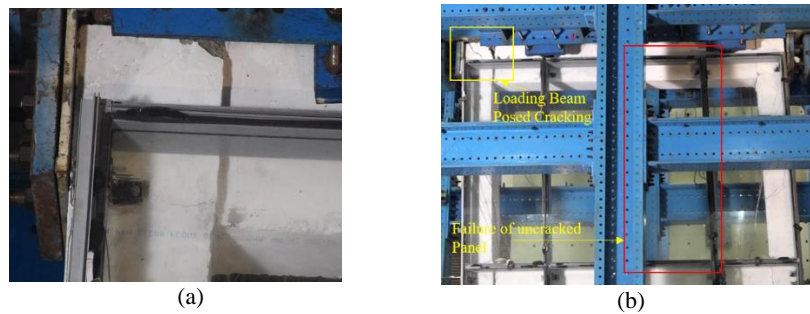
(a) loading beam-RC frame interaction (b) falling-out failure of the glass panel
